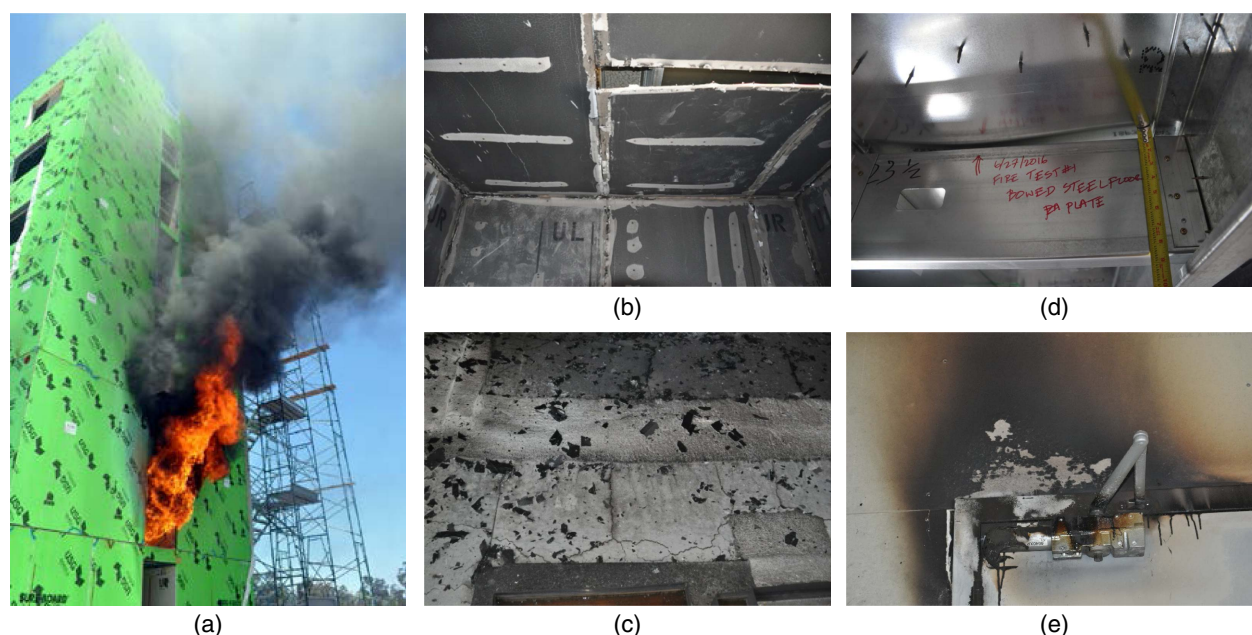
Fire-induced damage to the building system: (a) flame and smoke extension through the east corridor opening (Fire test 3); (b) partially detached ceiling gypsum board; (c) shrinkage and cracking of the cement board on the floor; (d) excessive floor deflection due to diaphragm sagging; and (e) melted door closer latch. (Images by Xiang Wang.)
